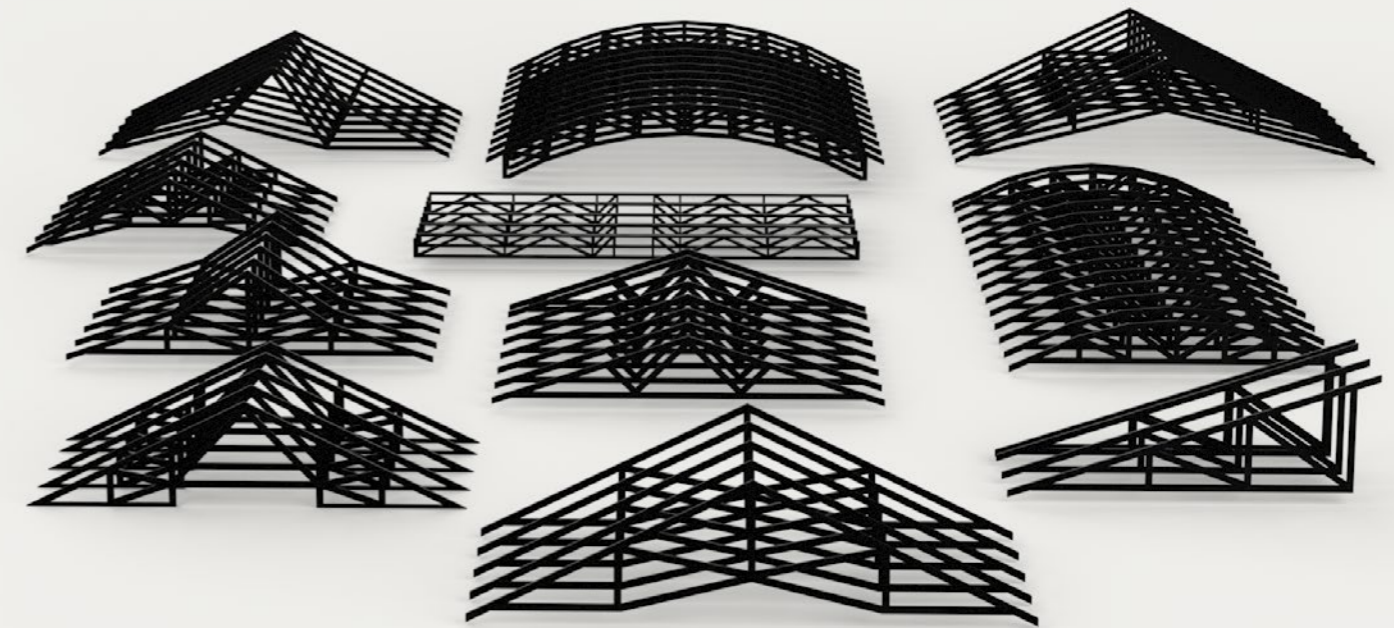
Lattice girders for carrying larger loads such as roof structures
